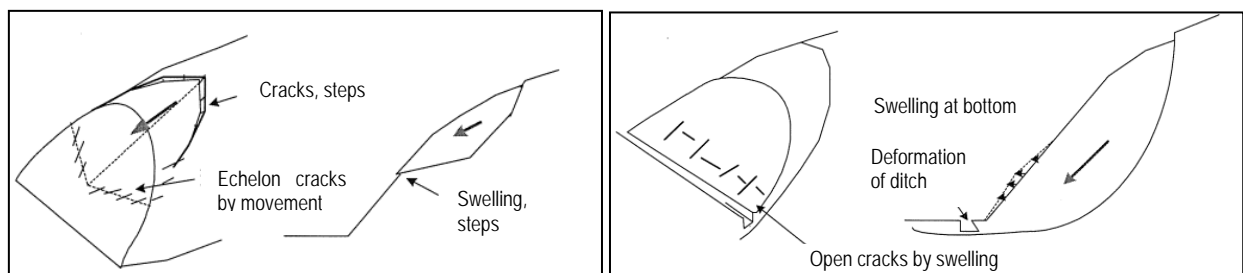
Example of Points to be Checked for Debris Slope Failure
